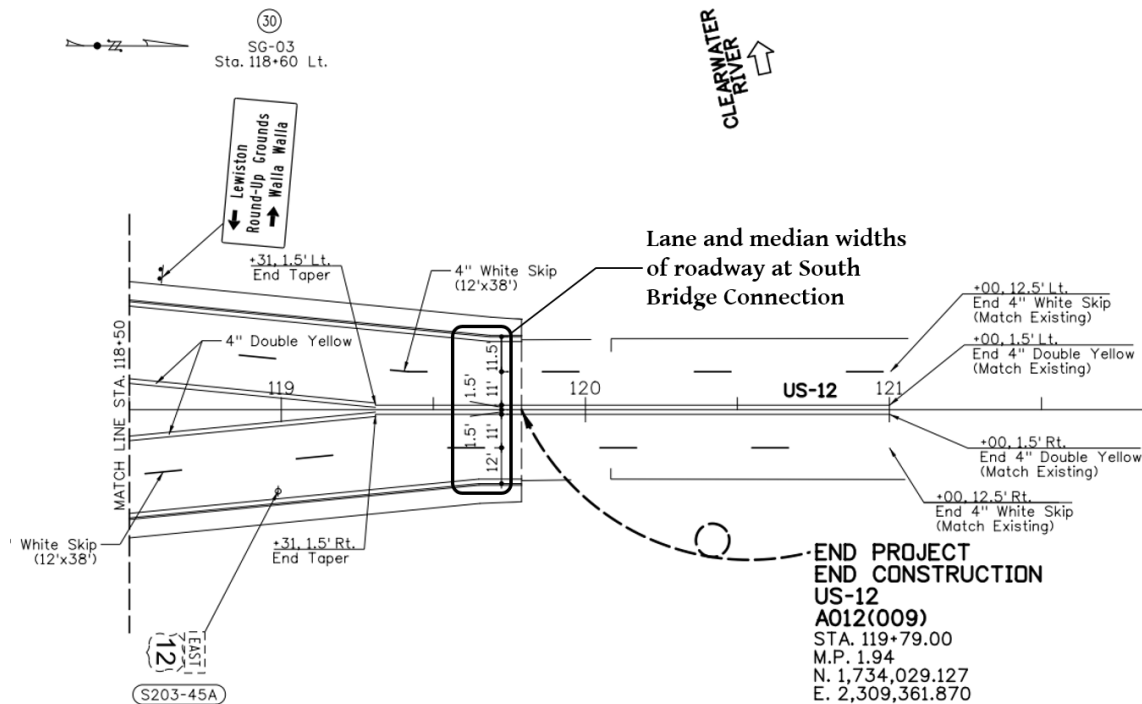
US-12 roadway configuration at the southern Memorial Bridge connection per the current level of design for the on-going US-12 & 21st Street Intersection Project
